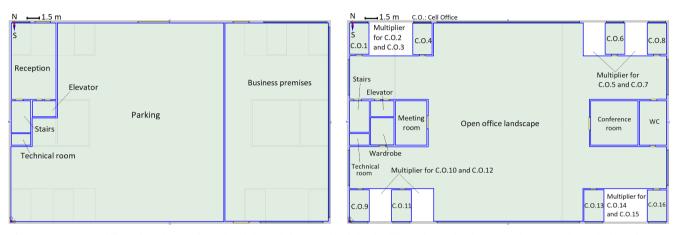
Generic ground floor plan, the first floor plan (left), and the second and the third floor plans at level 3.4 m and 6.8 m (right) with thermal zones.
